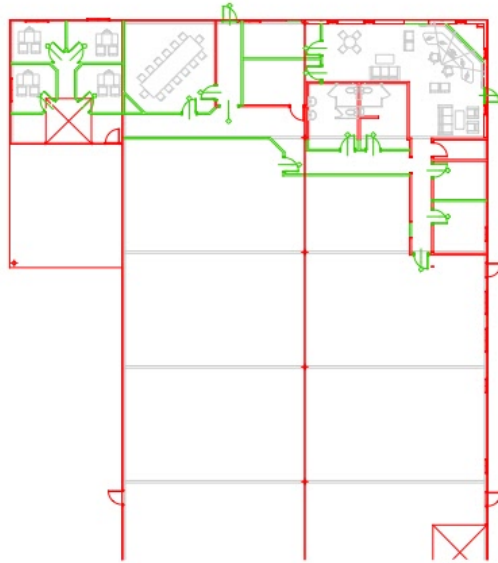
Conceptual New Floor Plan - Structures to remain highlighted in red, new structures highlighted in green.
